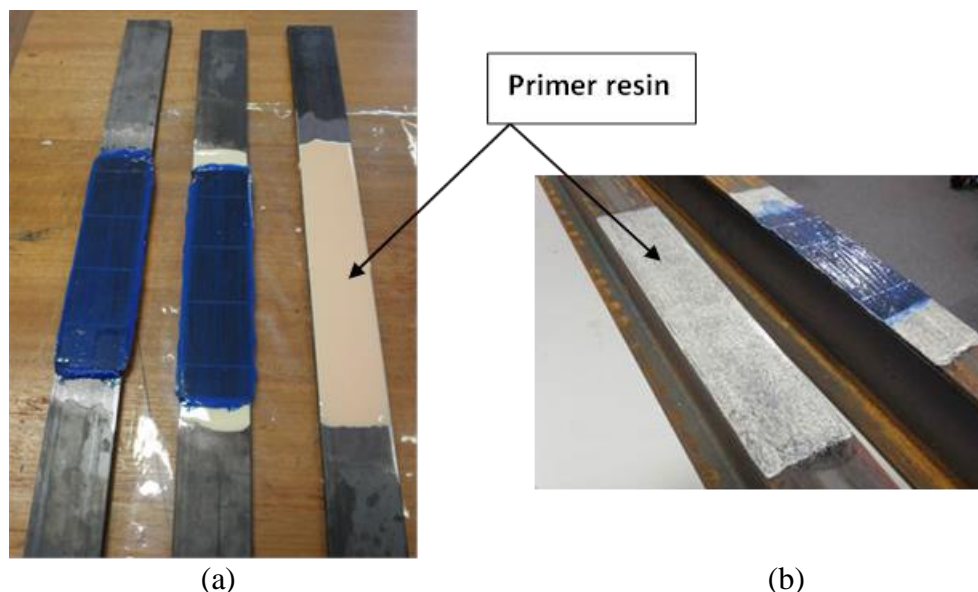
Specimens in preparation (a) Double strap joints (b) steel beam
